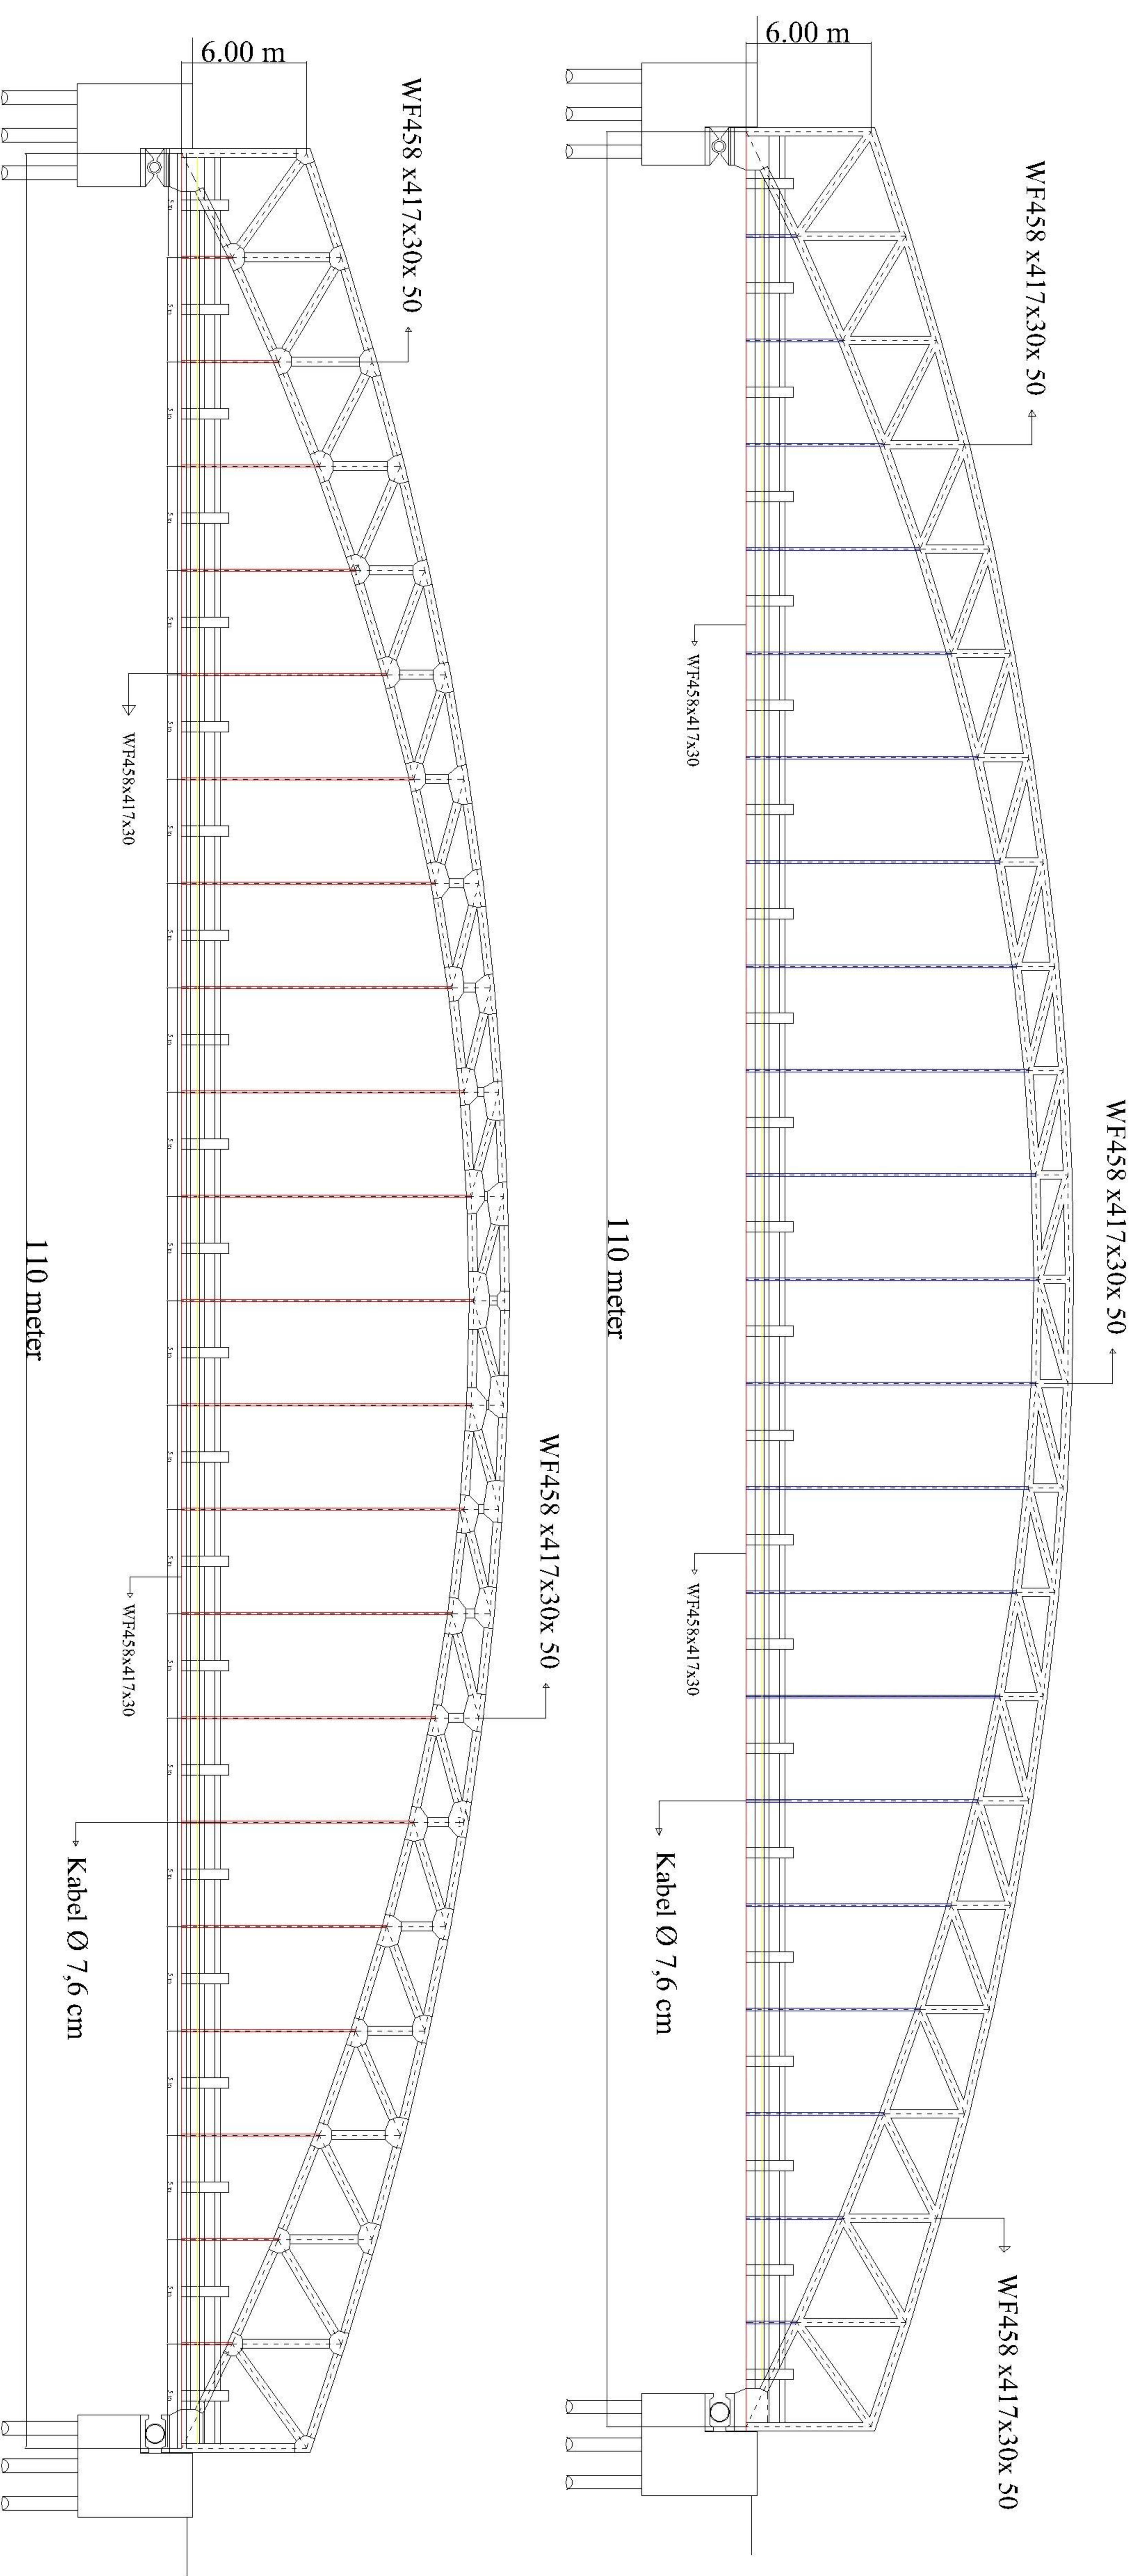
DETAIL OPEN AND CLOSE BRIDGE SOCKET
